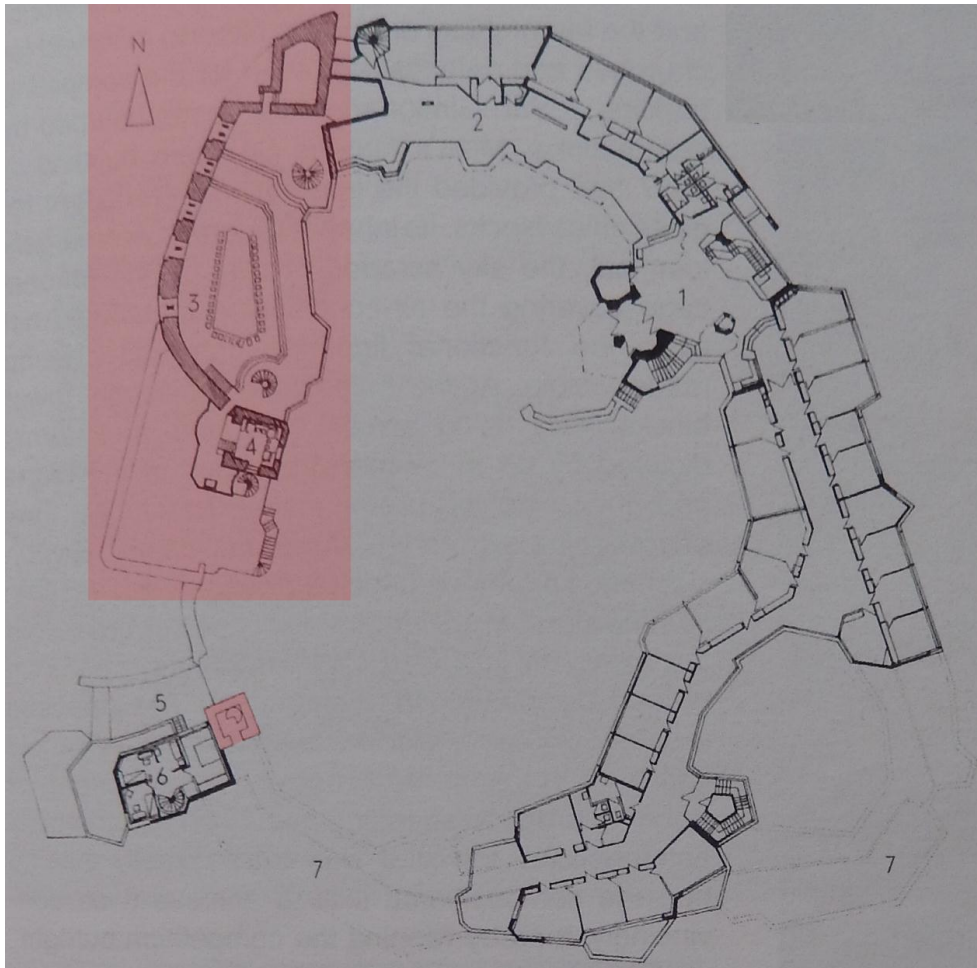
Ground floor plan of the Town Hall, the areas marked with red indicate the remnants of the historic castle (Blundell-Jones 2007, 51).
